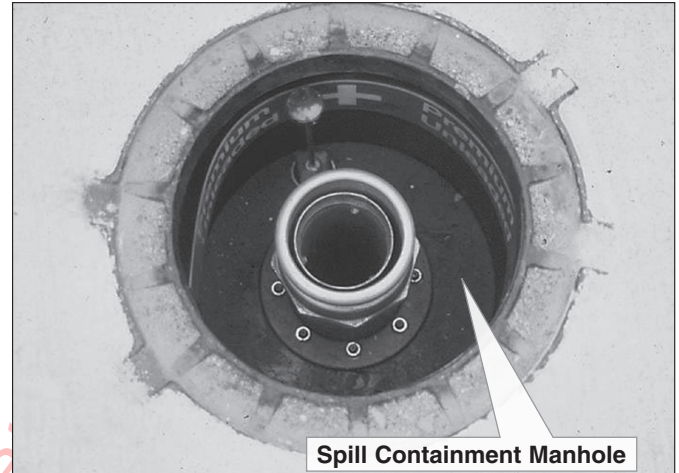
Spill containment manholes should be clean and dry. Drain mechanisms should be in good condition. The rim of coaxial drop tubes should be smooth and round.
